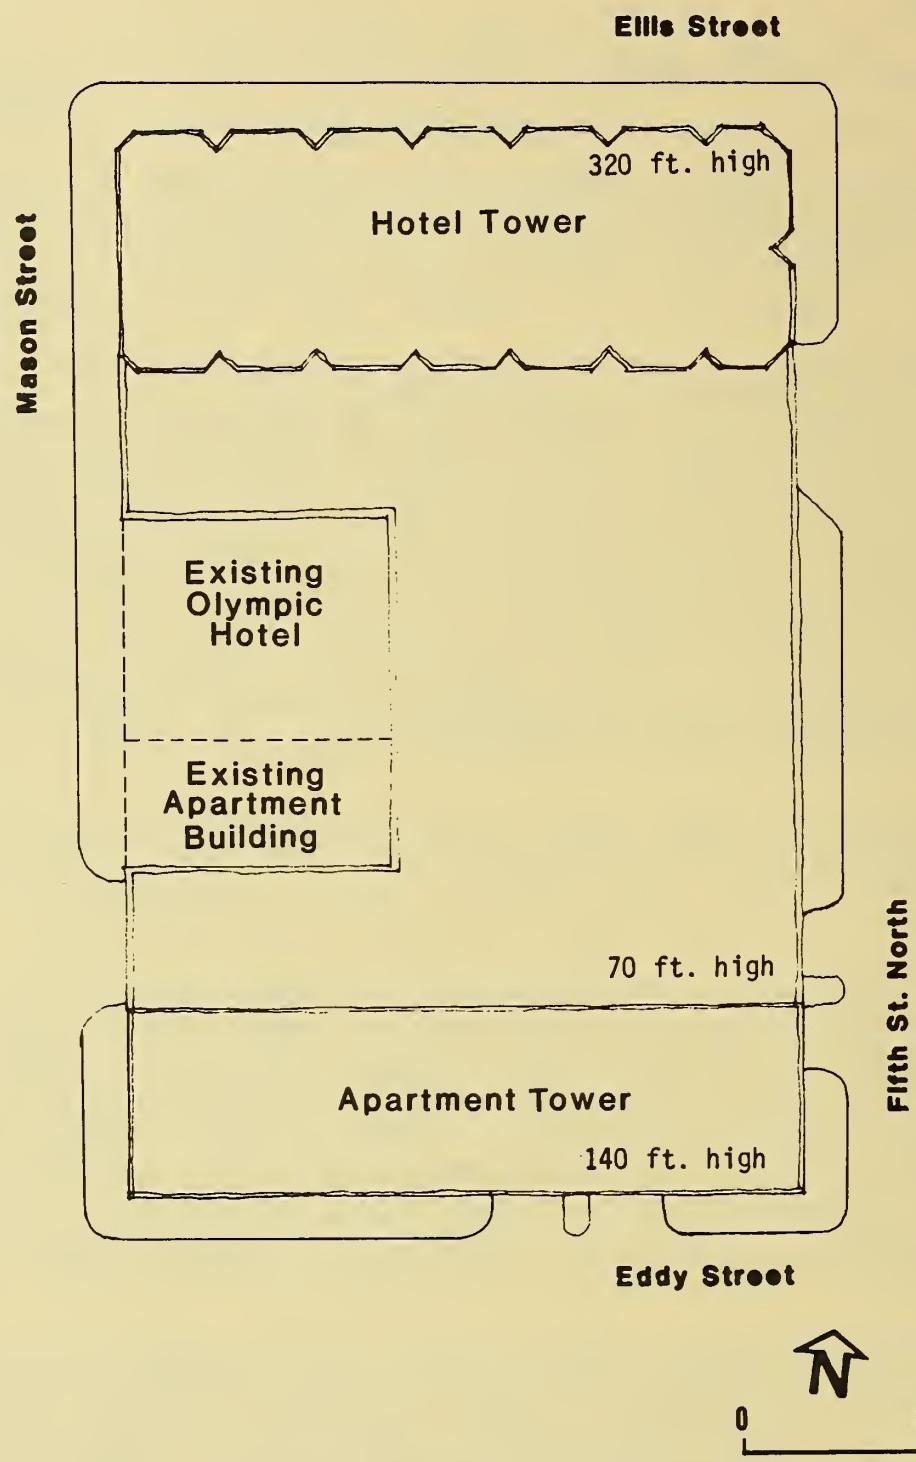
TWO-TOWER ALTERNATIVE - SITE PLAN
